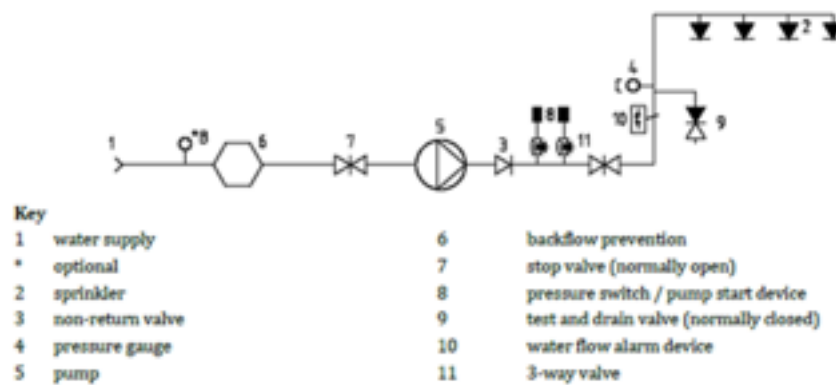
Typical arrangement for a tank fed sprinkler/watermist system with pump
